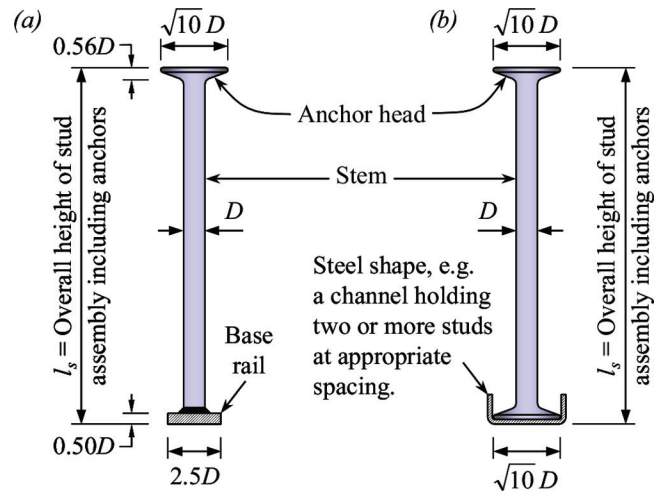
Stud assemblies conforming to ASTM A1044/A1044M: (a) single-headed studs welded to a base rail; and (b) double-headed studs crimped into a steel channel.
